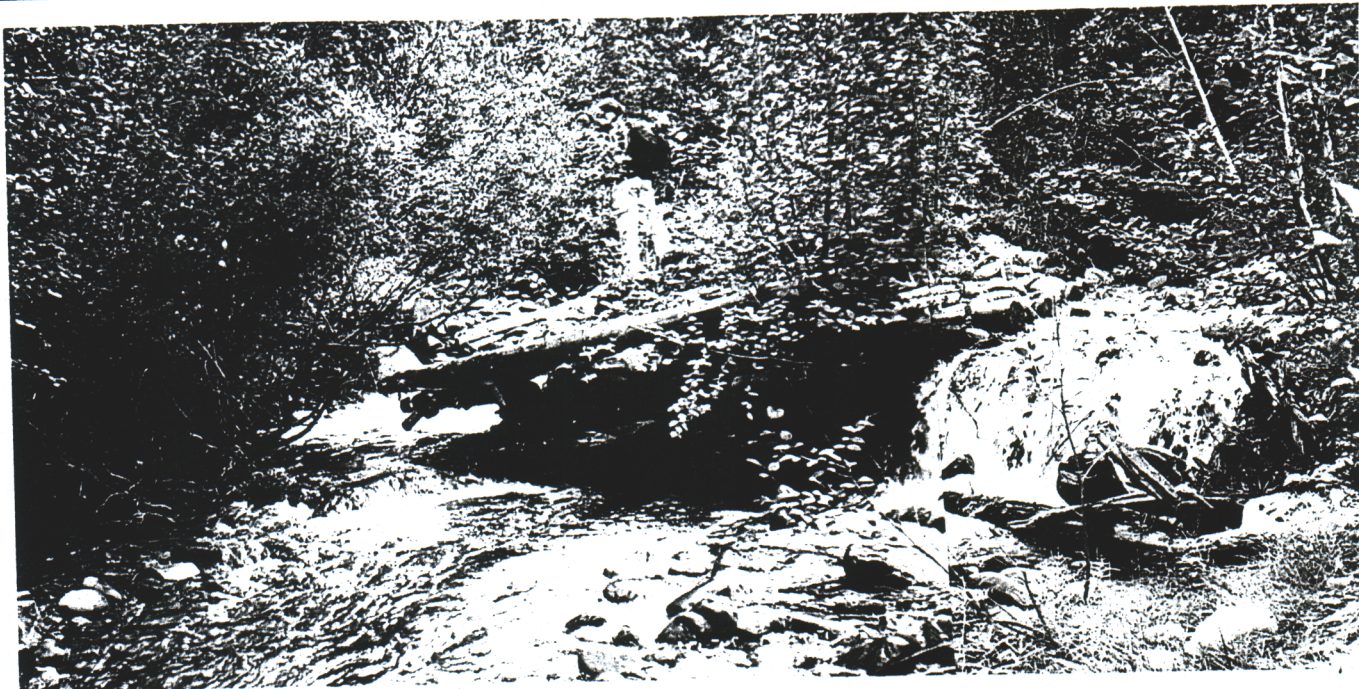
Bridge#1 collapsed into creek. Note log crib construction with earthen fill; note approximately 0.5 m drop in water level at right side of creek.
